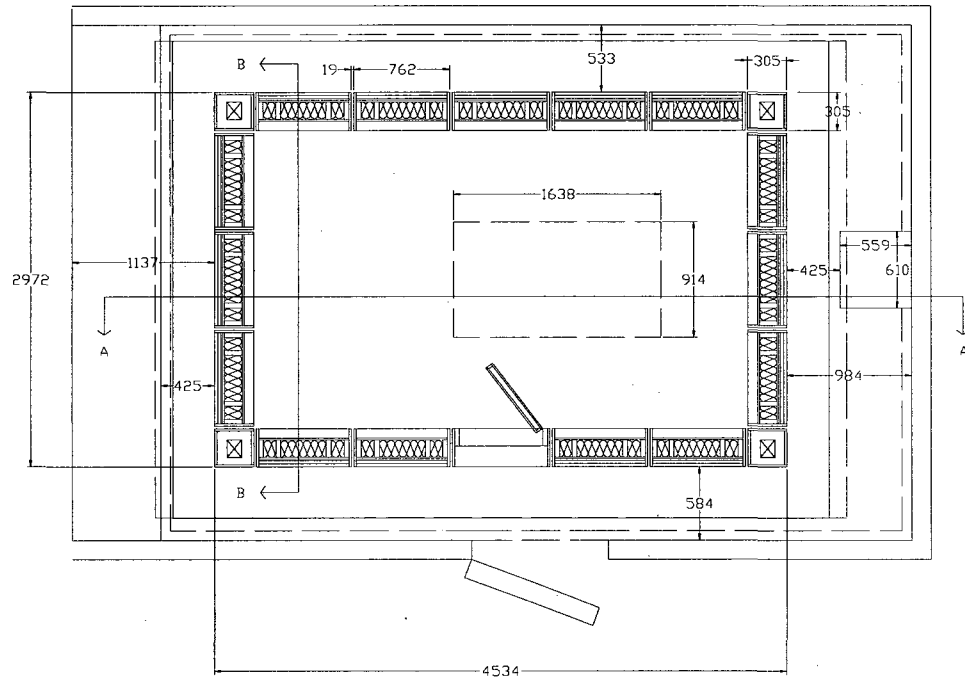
Plan of first floor of the test hut, the second floor has the same plan but with a wall panel replaced the service door (Alturkistani et al. 2008)
